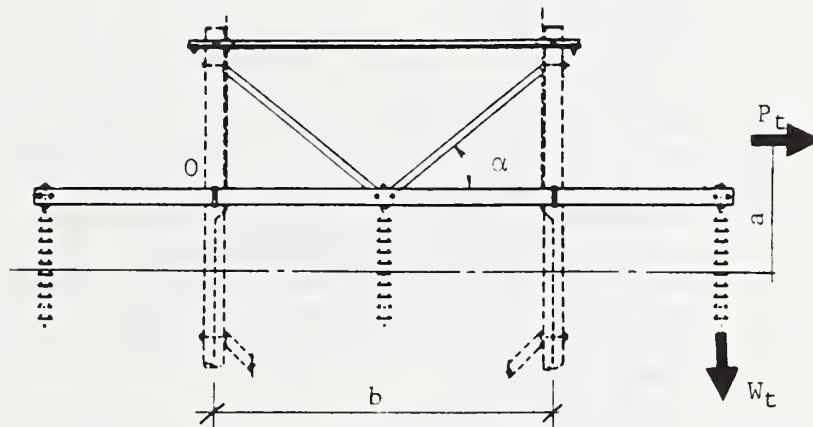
POLE TOP ASSEMBLY WITH INSIDE BRACES
